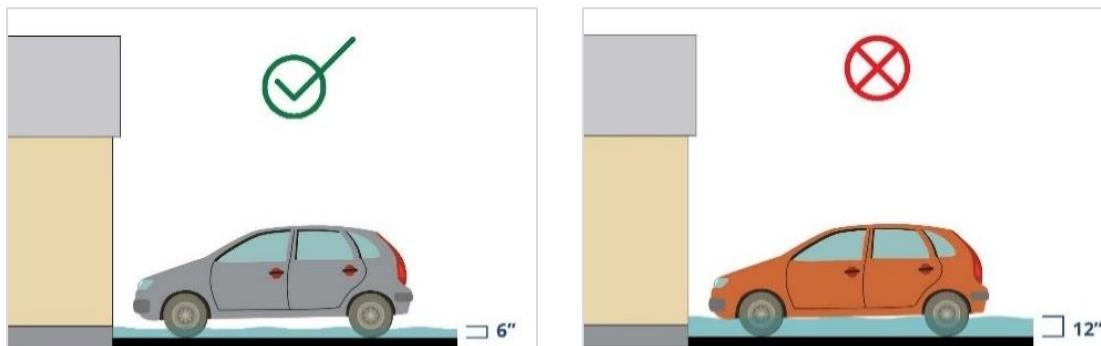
Example new driveway designs that do and do not meet the dryland access requirement.
